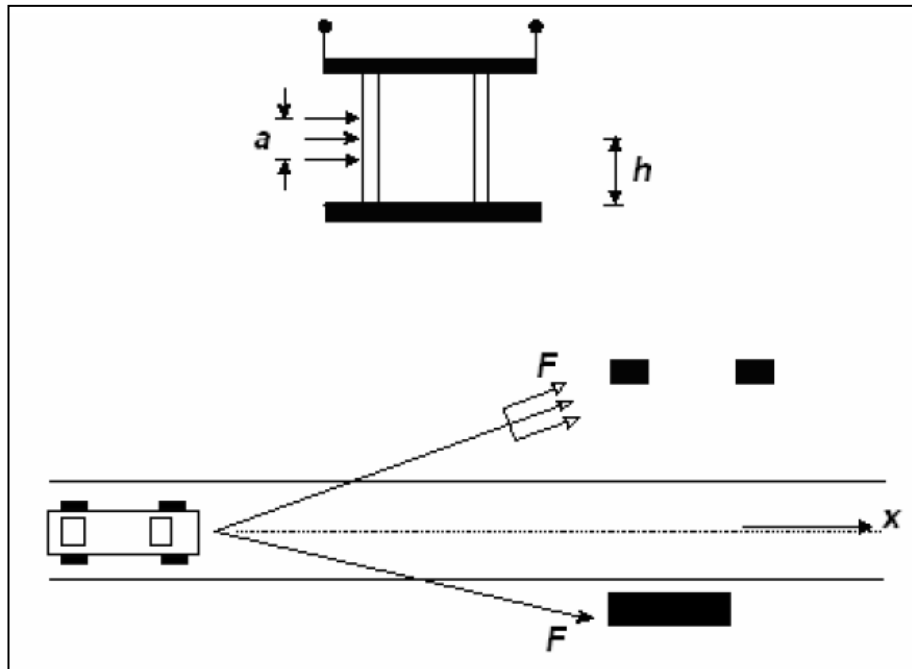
Collision force on supporting substructures near traffic Lanes for bridges and supporting structures for buildings.
